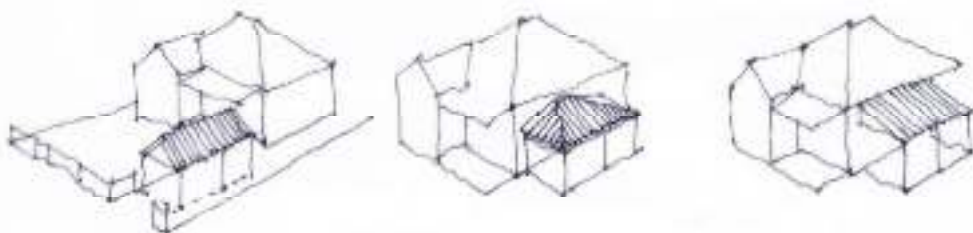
The design and detailing of car ports should interpret with replication, traditional details and use traditional materials.
